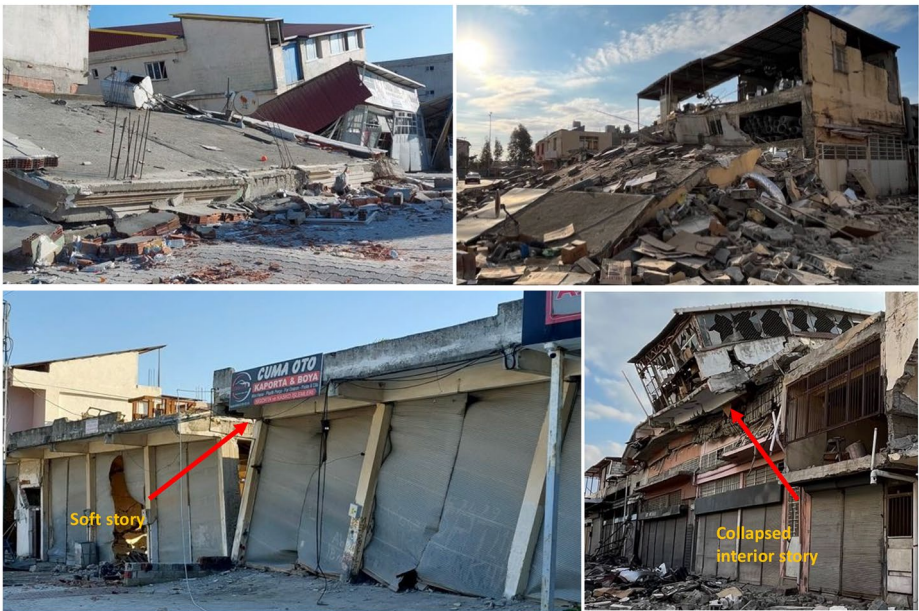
Several collapsed reinforced concrete facilities at small industrial sites due to weak column-strong beam failures: in Antakya (left) and Iskenderun (right)
